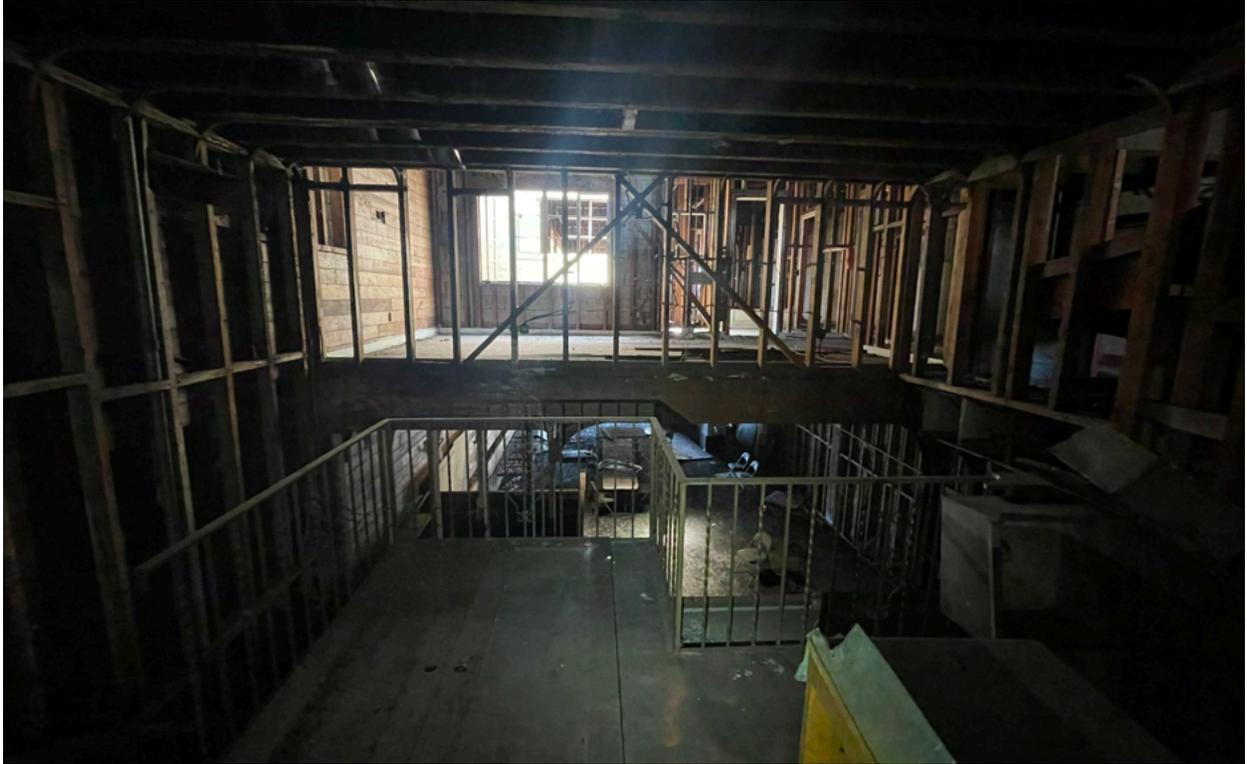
(Top) Mezzanine level, facing west, Groundwork Preservation LLC, 2025.
